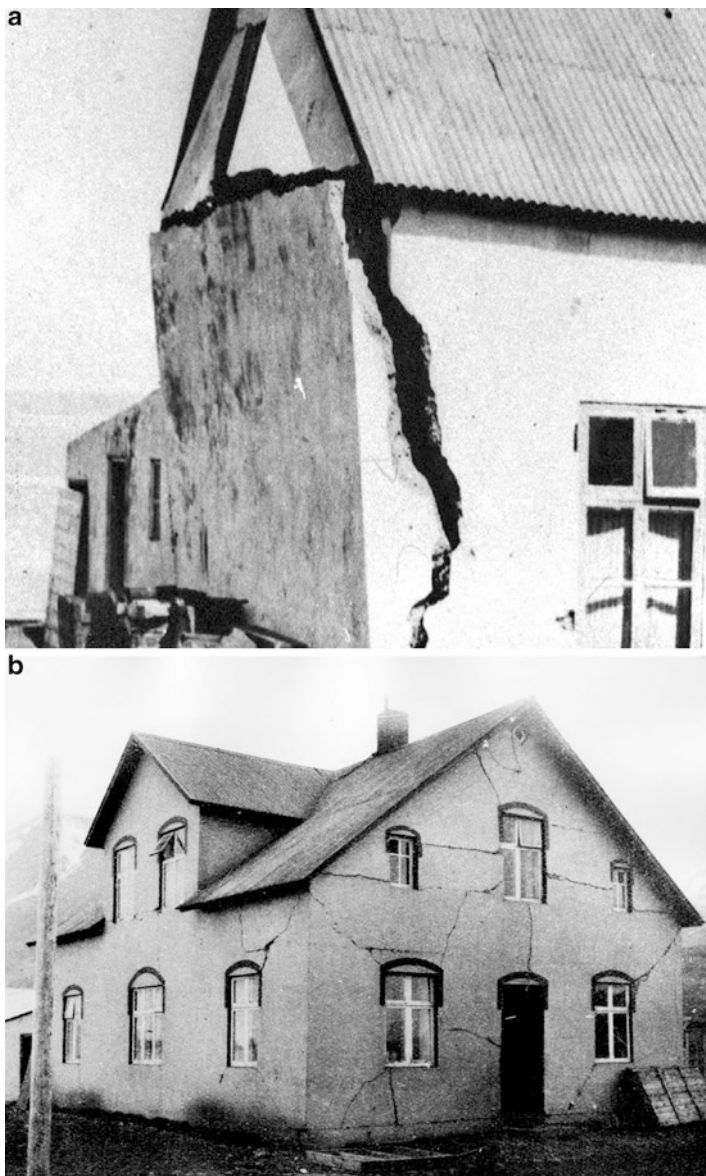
Damaged concrete buildings at Dalvík after the Ms6.2 earthquake in June 1934 (Photos: (a) Svarfdælinga Provincial Archives, (b) National Museum and RUV)
